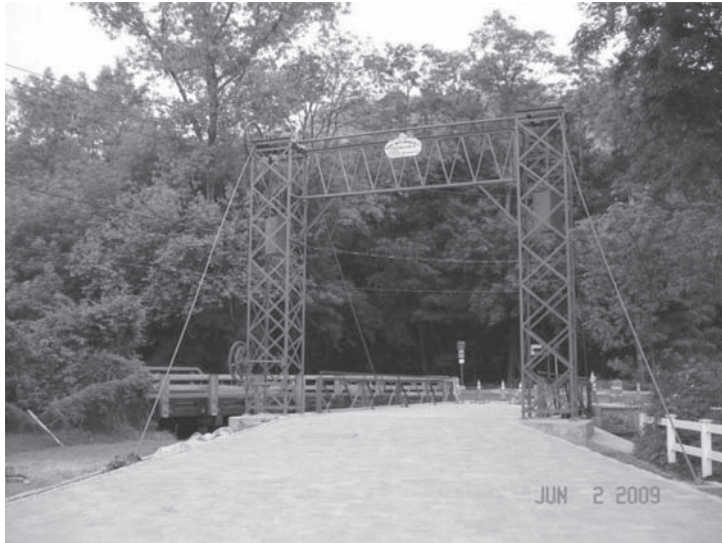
Substantial completion of the Bridge Street Bridge. Note the paving blocks used for the north approach.
